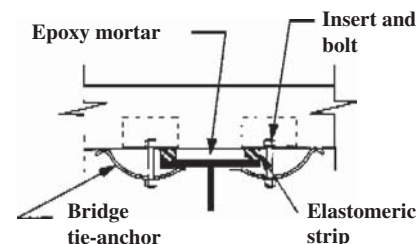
Grout dam built using elastomeric strips (Clark's Summit bridge, Pennsylvania Turnpike)
